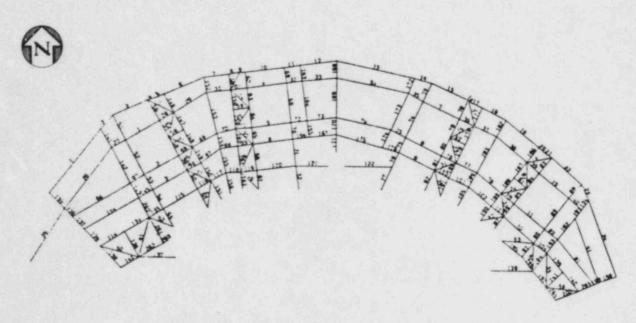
STRUCTURAL STEEL FINITE ELEMENT MODEL (Sheet 1 of 4)
